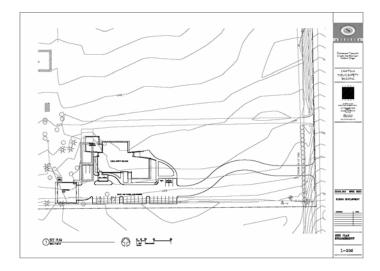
Proposed Public Safety Building Site Plan.
